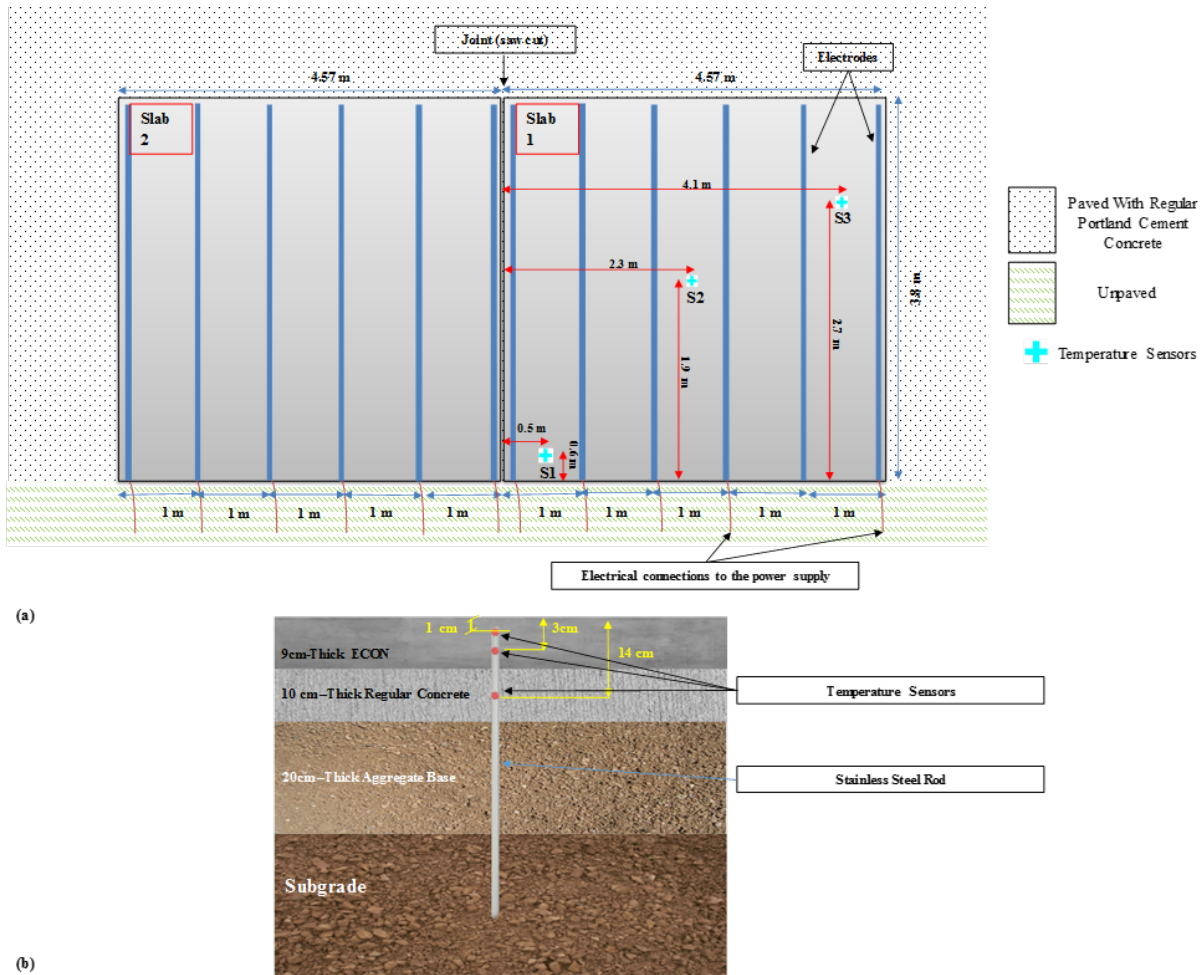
System configuration and sensor locations for each slab; a) plan view of slabs; b) the cross section of a slab with embedded sensors.
